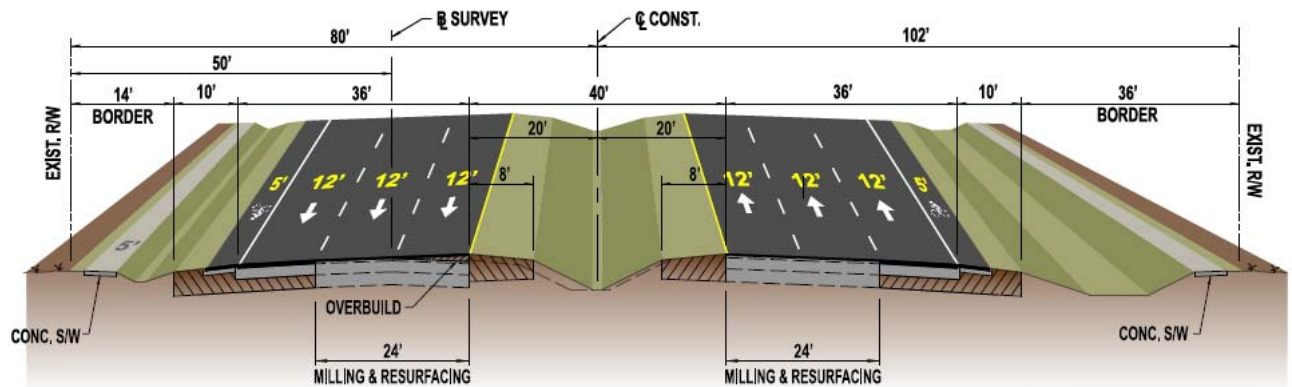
RURAL NEW CONSTRUCTION TYPICAL SECTION
